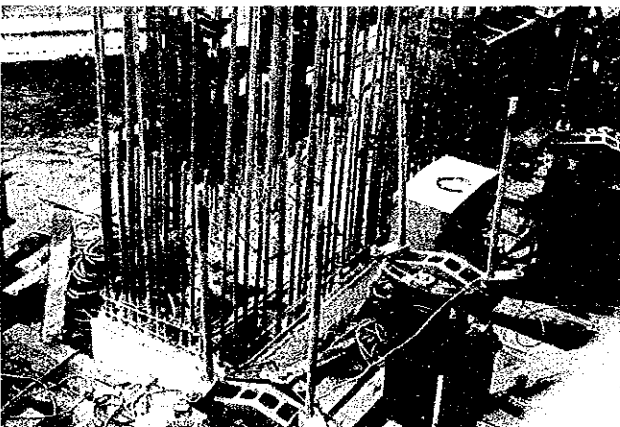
Arrangement of reinforcing bars (deformed bars are used and bars are properly tied with hoops)
